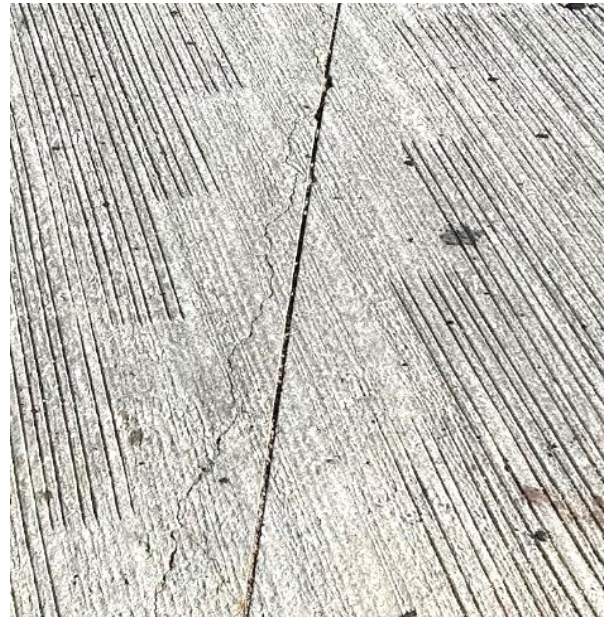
(e): More cracking at closed joint in center stage at Bent 3 (Construction Stage I)
